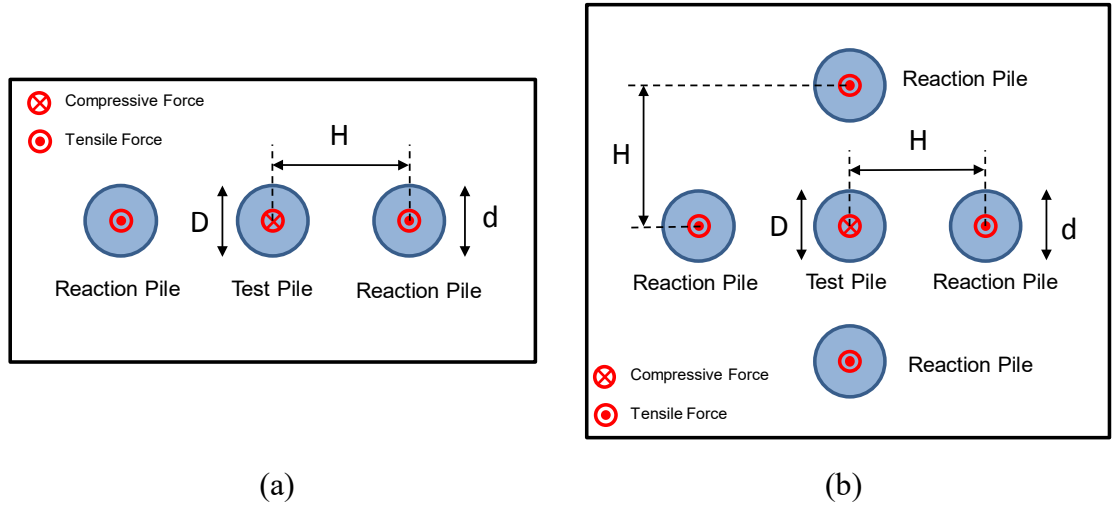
Plan view of a simulated static load test with (a) two reaction piles and (b) four reaction piles
